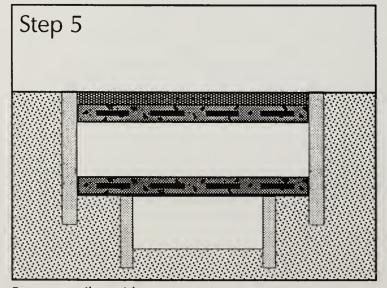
Proposed Construction Staging: CA/T Rail Link Interface
